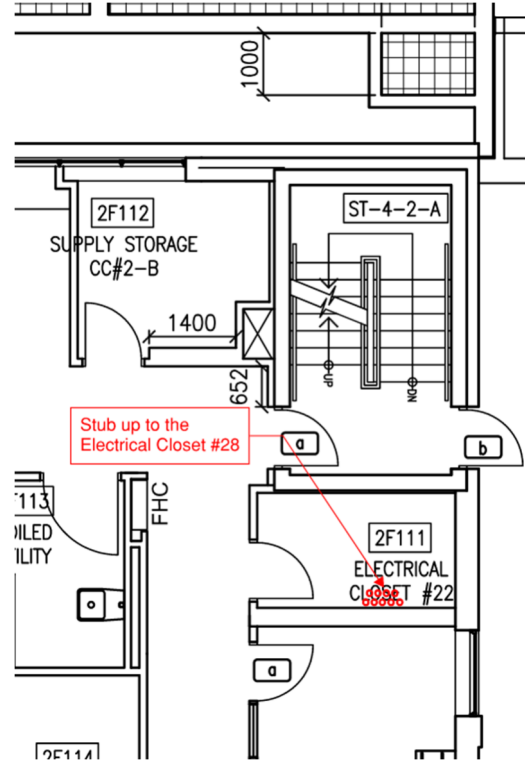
Proposed conduits stub up in Electrical Closet #22
